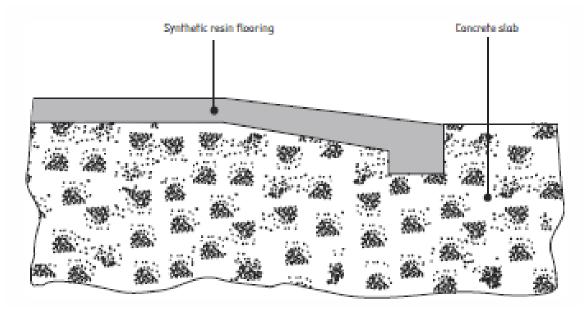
Toe-in Joint for Floor and Wall Terminations (Ref. BS 8204.6)
